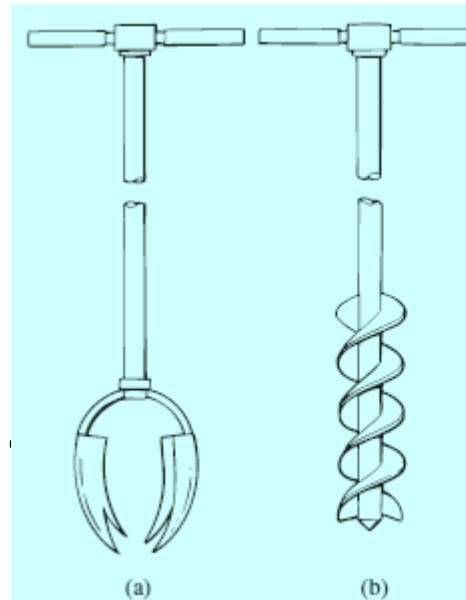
Hand tools: (a) posthole auger; (b) helical auger
